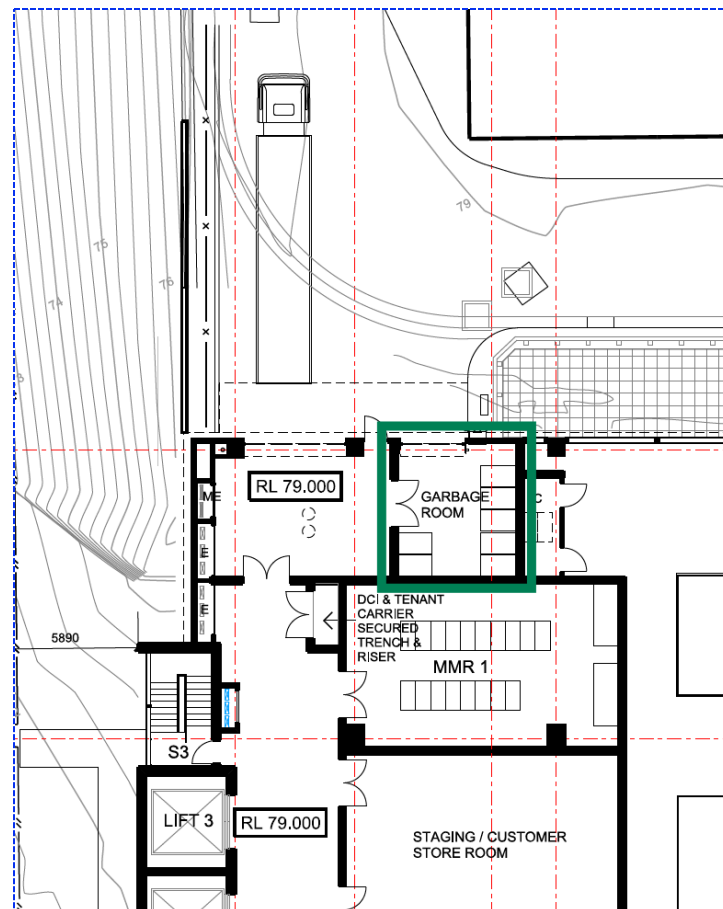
Waste storage area location is on upper ground floor – ar—1202 – DEM
